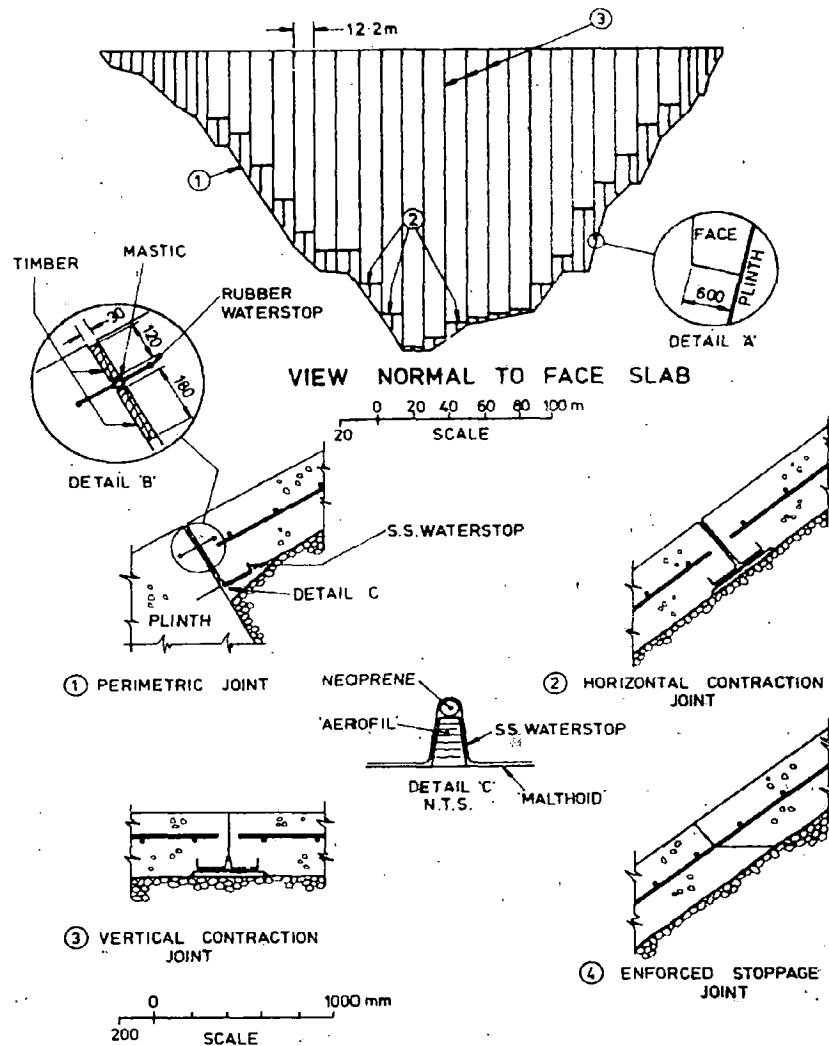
Lower Pieman Dam – Joint Layout and Details
